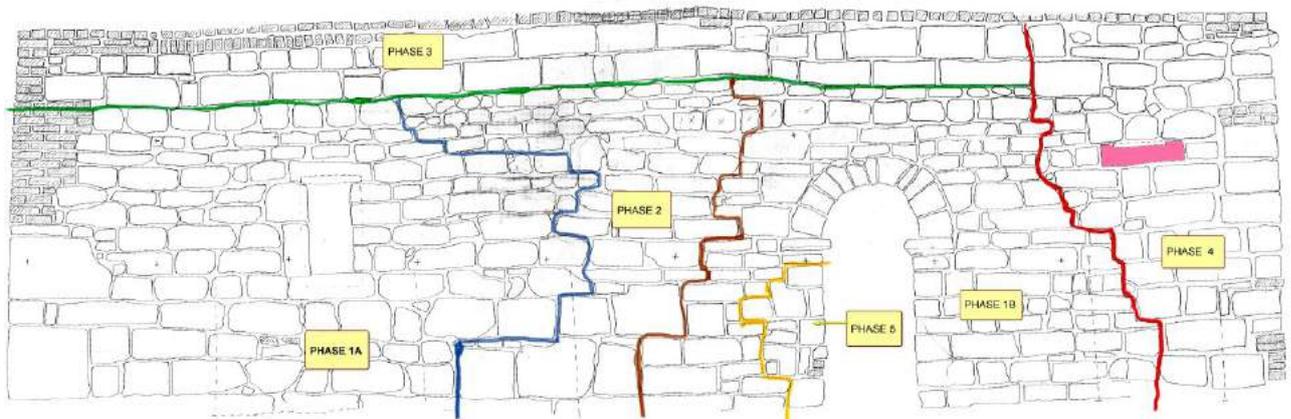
Phasing plan for the north wall of Sutterby Church - note phase 4
